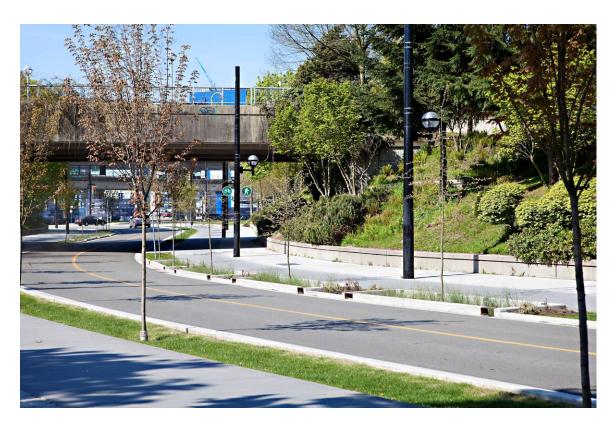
Figure XIII: Stormwater Infiltration Planter Boxes (Andy Livingston Park)
